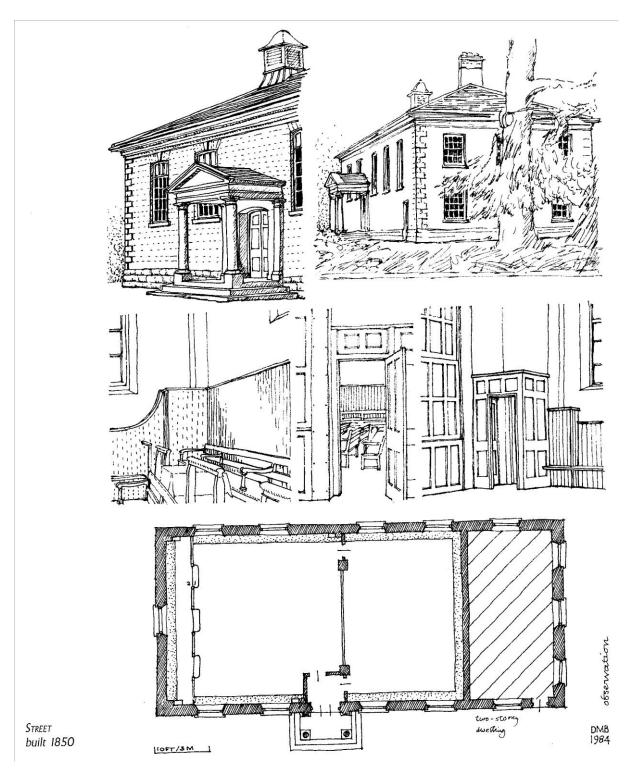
ground plan, two perspective views, section and details from the main meeting room. North is to the top of the plan. (Butler, vol. 2, p. 547)
